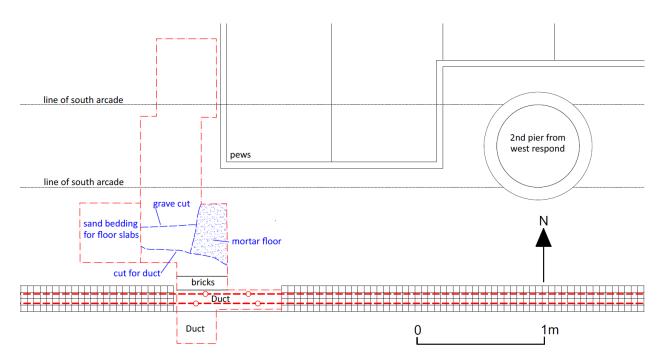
Plan of archaeological features in new duct south aisle-nave, plotted onto engineer's plan
